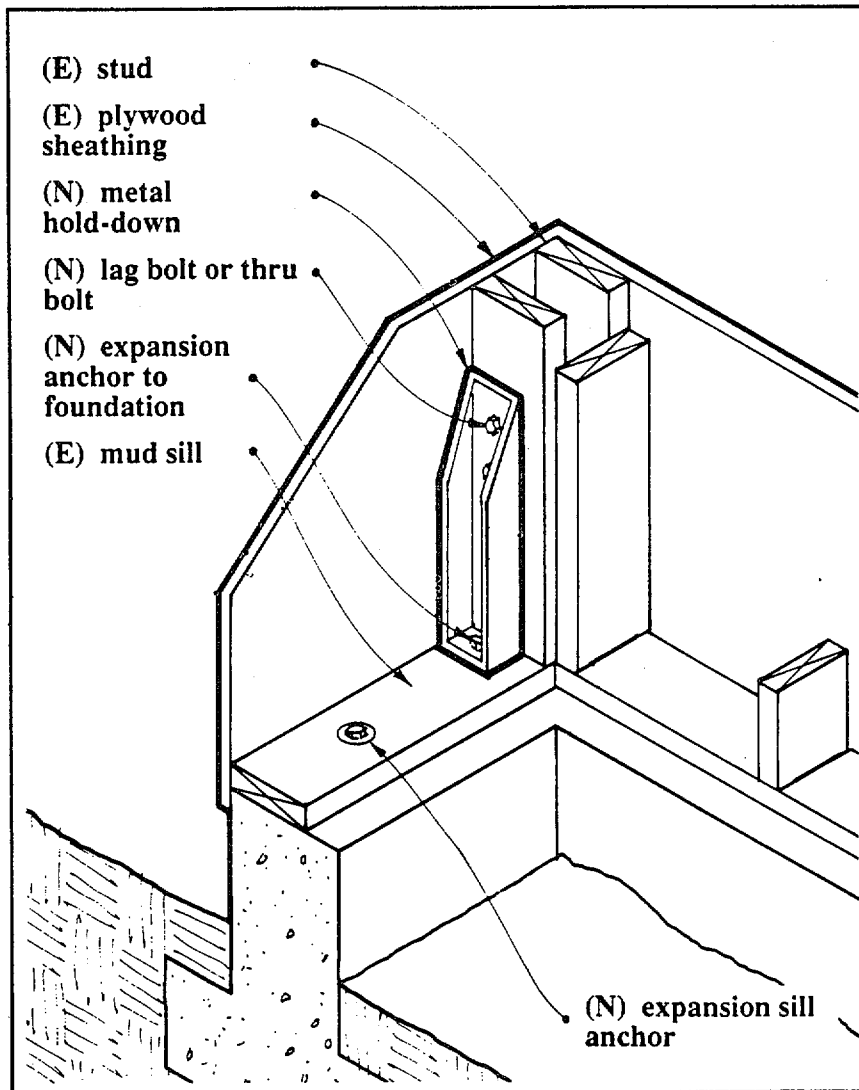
Strengthening the uplift capacity of wall to foundation connection.
